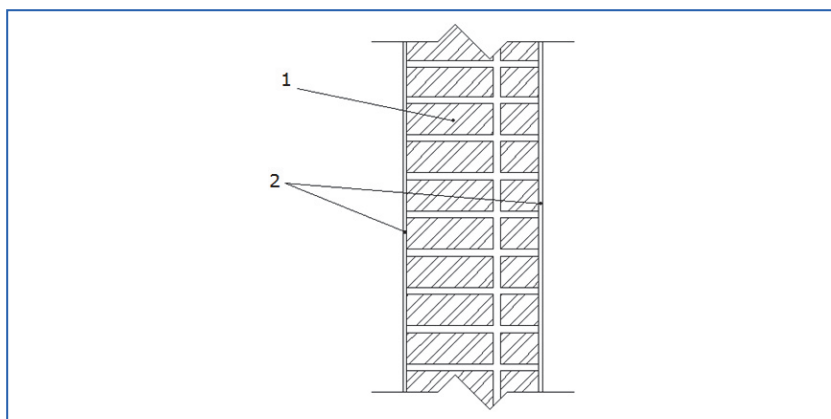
Wall. 1 – 380 mm ceramic or silicate brick; 2 – finishing.
